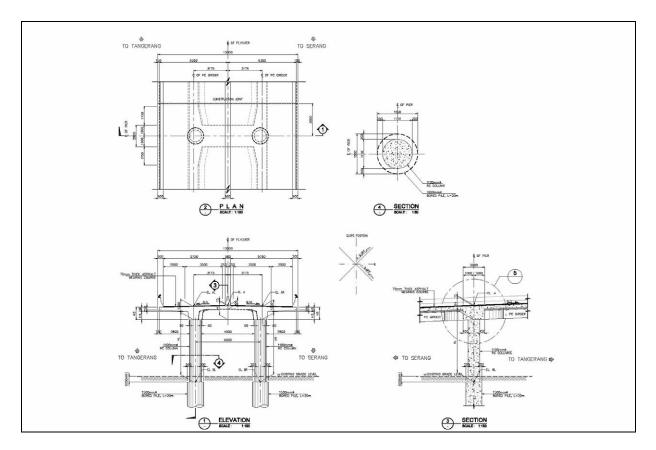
TYPICAL TWO COLUMN PIER
